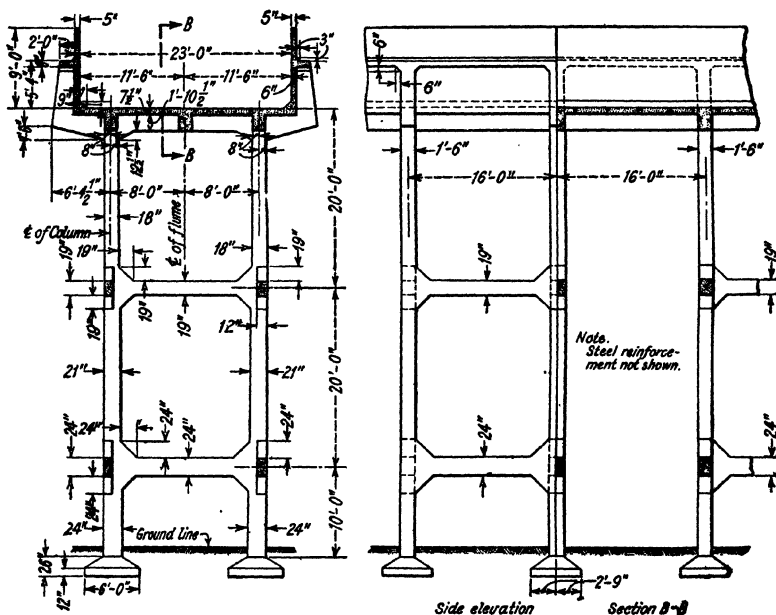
Cantilever Type of Concrete Flume on Trestles.
